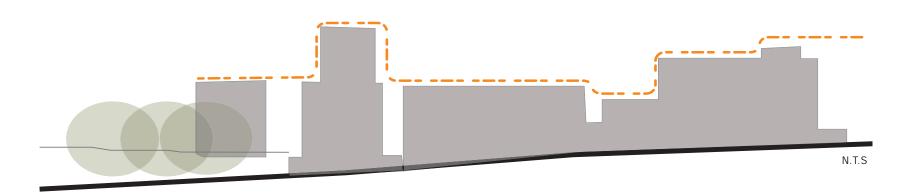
Existing Streetscape profile along the southern side of New South Head Road.
